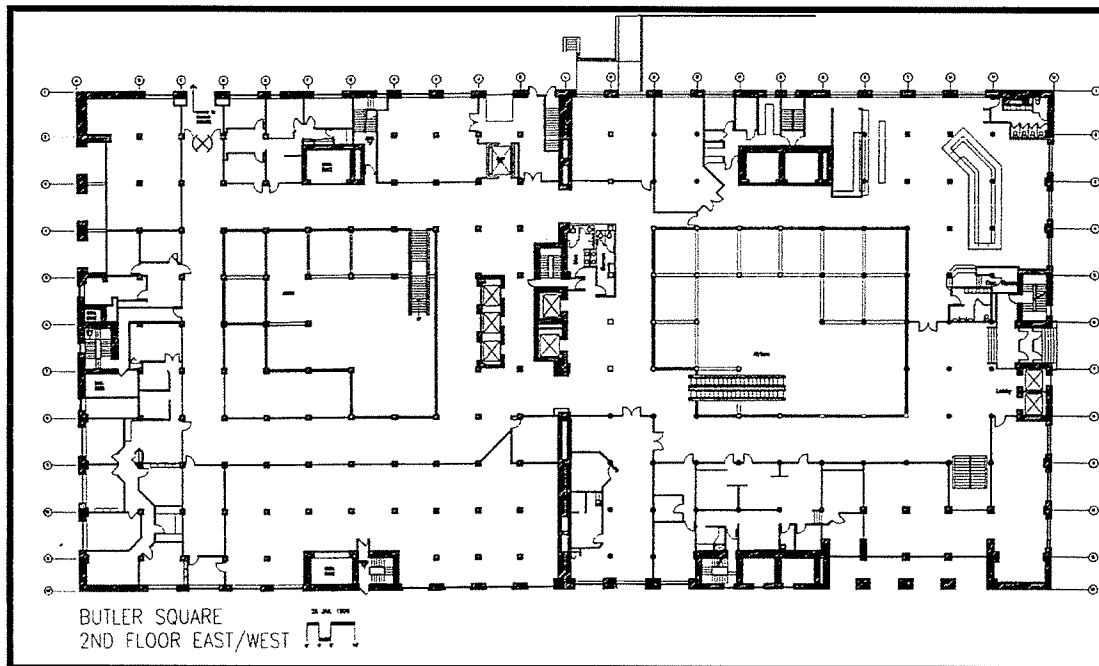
Key Plan Second Floor compliments of United Properties, Minneapolis, drawn by Jafvert, Mueller Architects, Inc.
